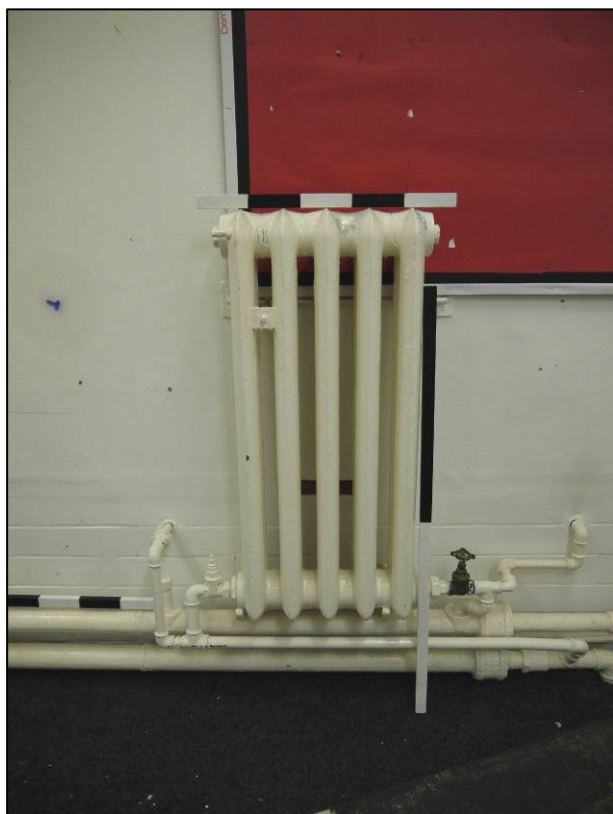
1911 school building (Block 1), classroom (G/006A), rib-type radiator to west wall, looking NW (photo 1/025).
